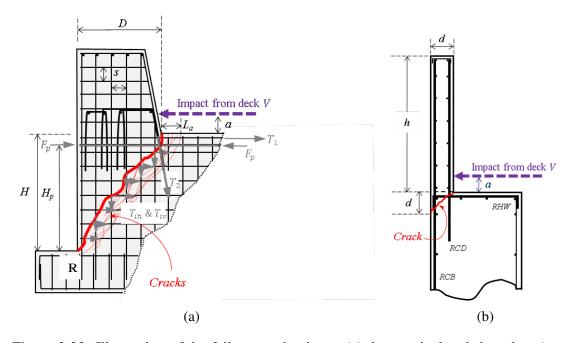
Illustration of the failure mechanisms: (a) the non-isolated shear key (out-ofplane breadth noted as b); and (b) backwall passive fracture (out-of-plane width noted as w).
